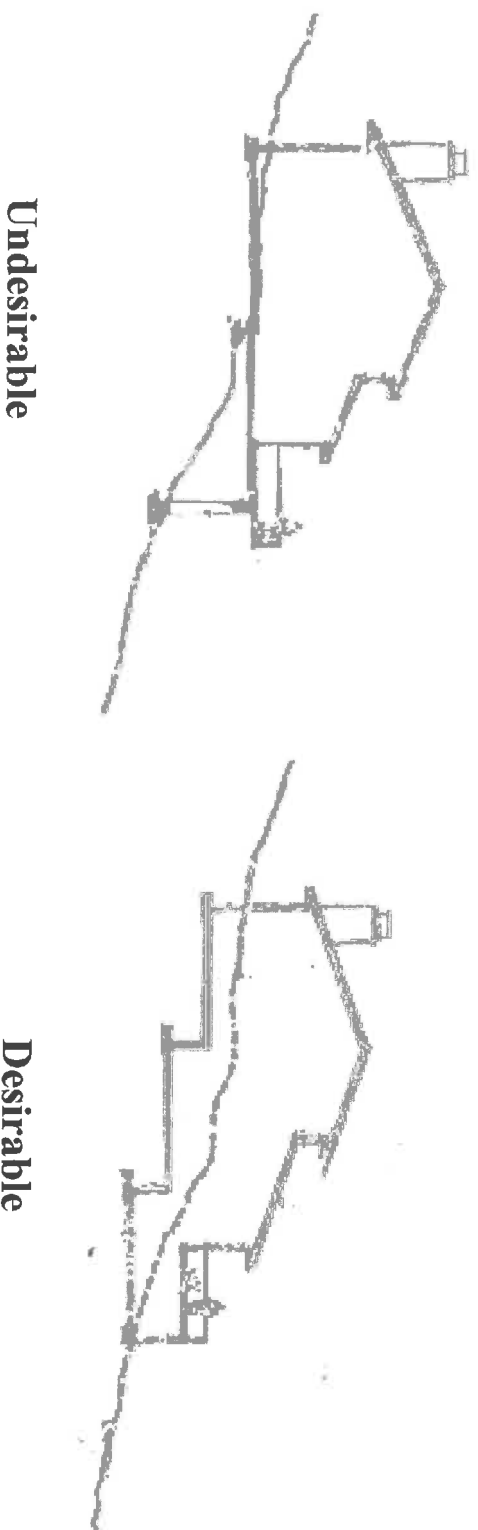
The desirable design mitigates bulk by stepping down with the slope and breaking long continuous roof and building walls into smaller elements.
